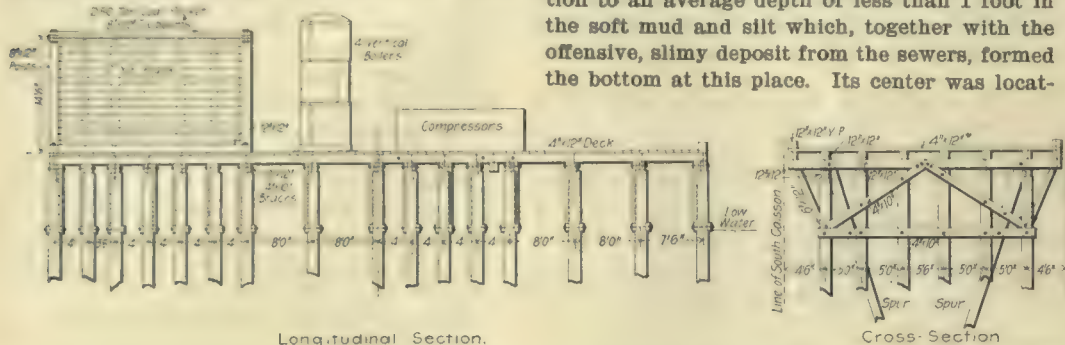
PROTECTION PIERS, BROOKLYN CAISSONS.
